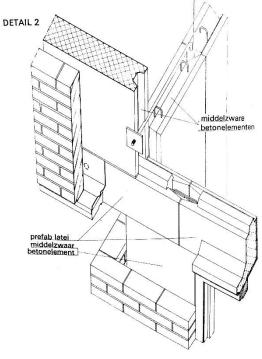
Detail floor connection. Reprinted from (Van Elk & Priemus, 1971)
